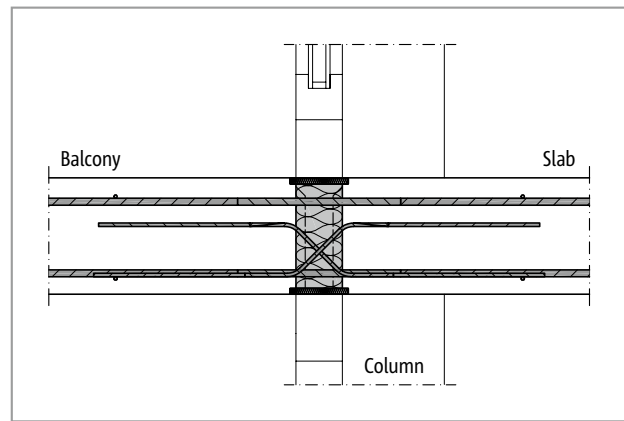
Schöck Isokorb® T type D: Installation section; one-way spanning
